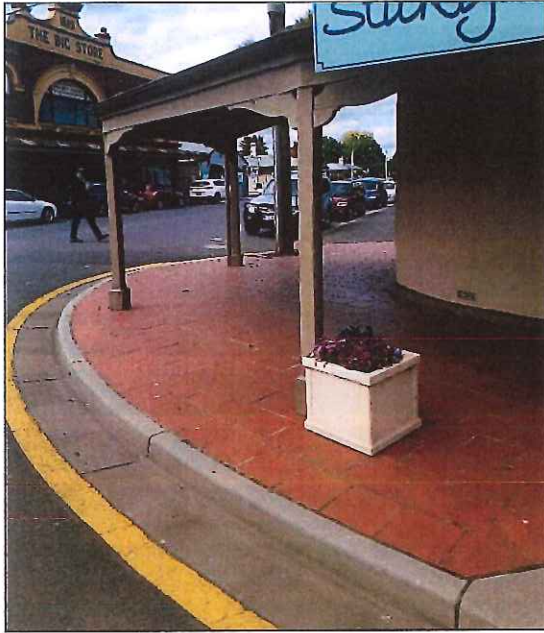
Pedestrian crossing outside Sticky Beaks Café
